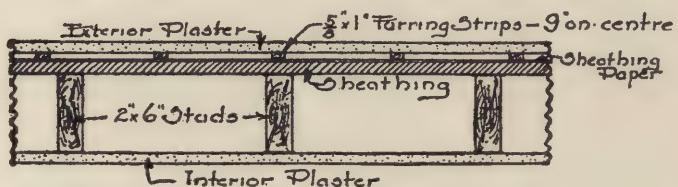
Wall Section, Plastered House, Half-Timber Effect.
